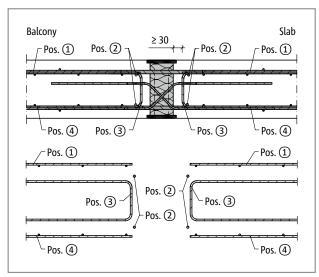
Schöck Isokorb® T type D: On-site reinforcement
